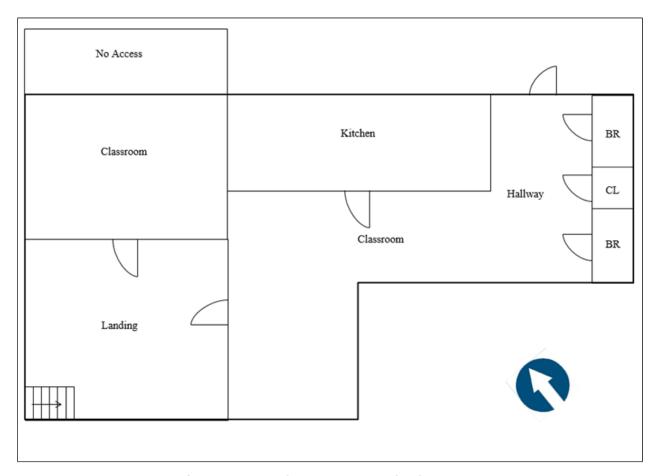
BASEMENT INTERIOR SITE PLAN
